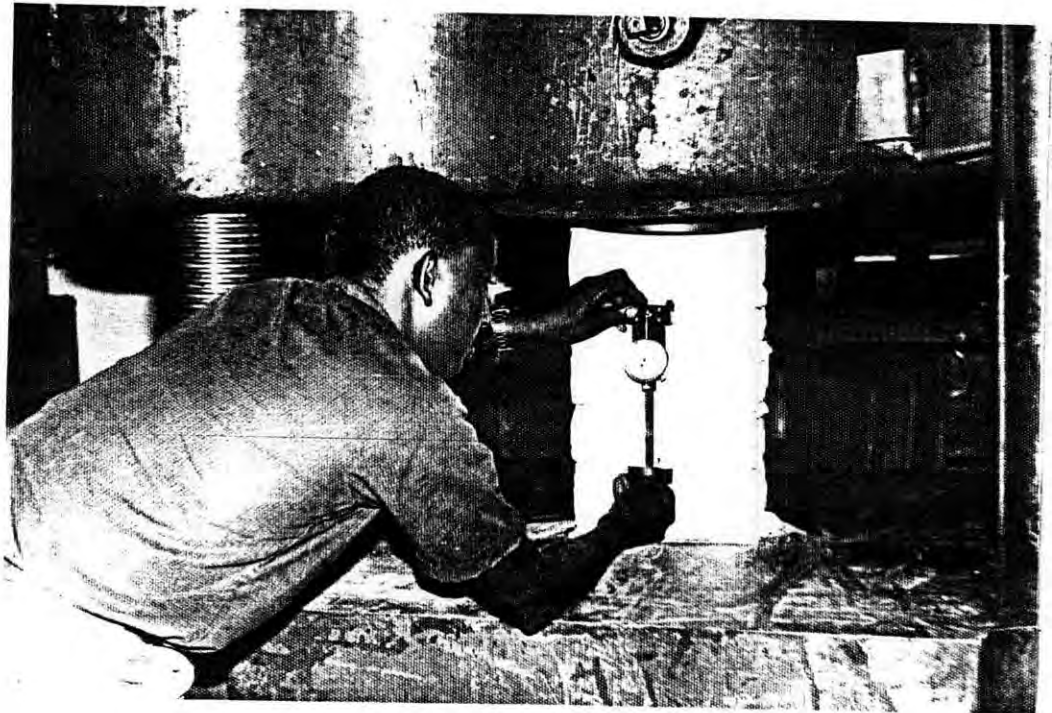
Testing Arrangement for Vertical Deformation of Brick Masonry.
